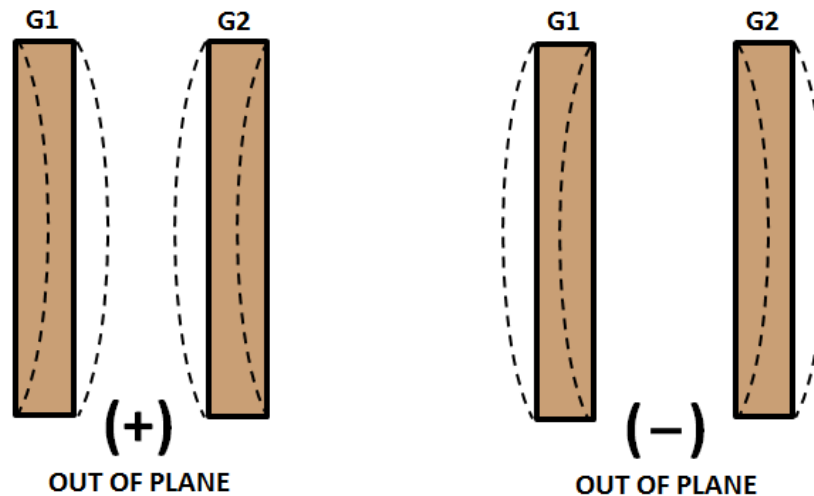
Plan View of Girders Showing Out-of-Plane Bending Stress Sign Convention
